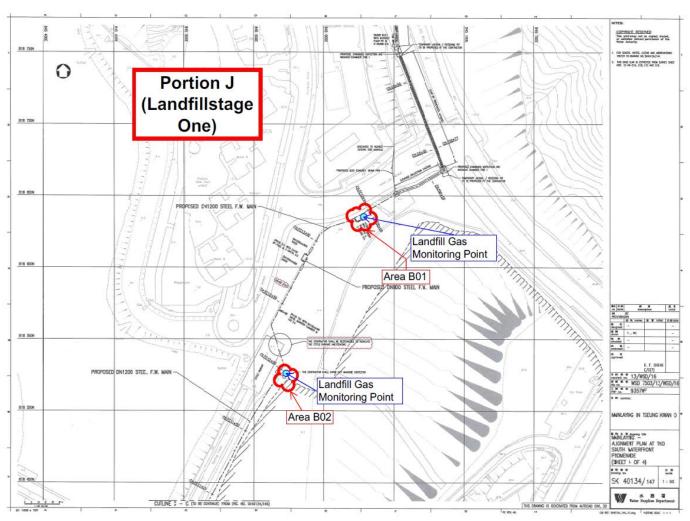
Location Plan for Portion J – Landfill Stage 1 (Area B01-B02)
